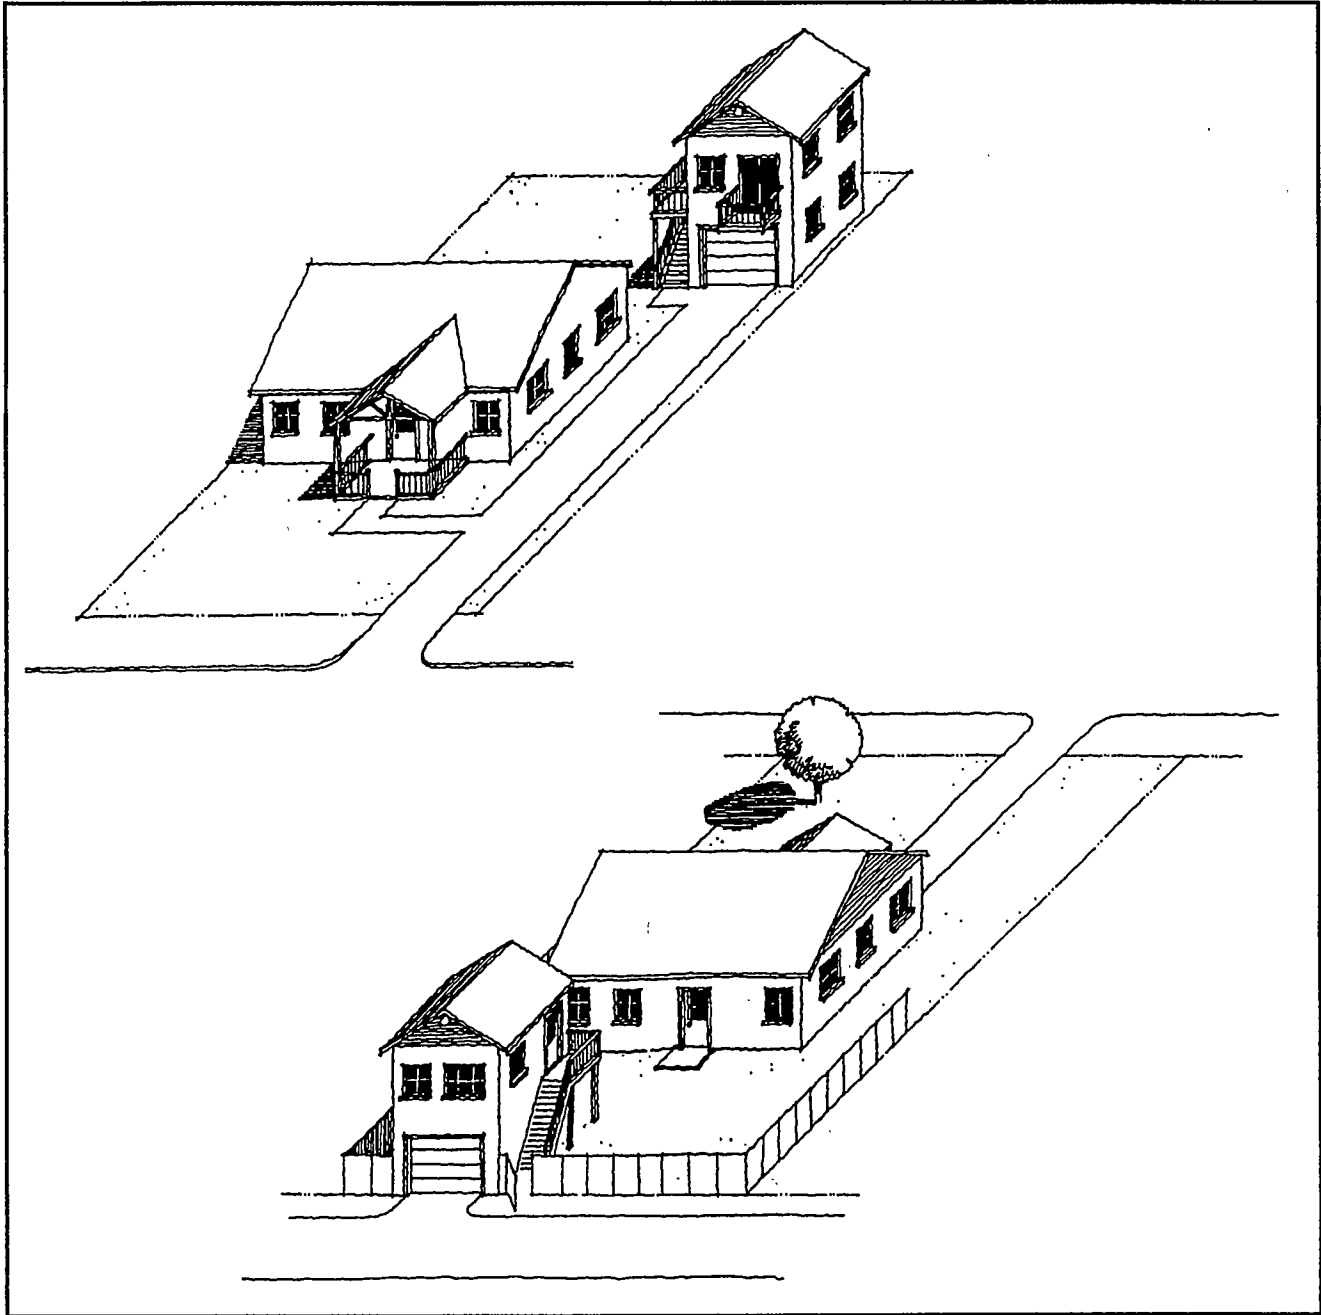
Infill Housing Types R-9 & R-9A: Garage Apartment & Garage Apartment with Alley Access
